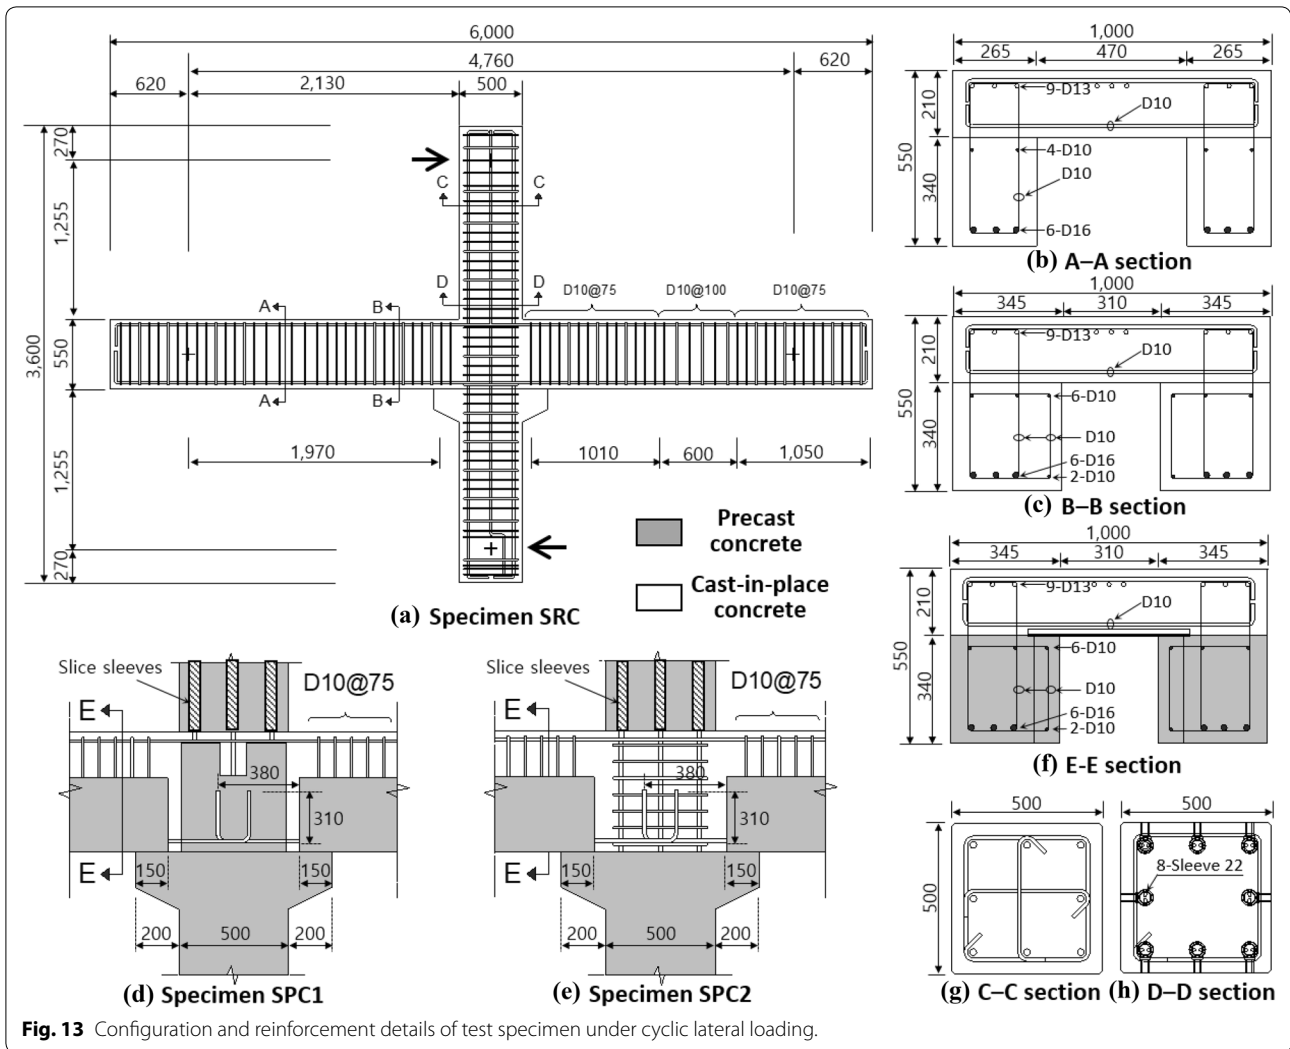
Configuration and reinforcement details of test specimen under cyclic lateral loading.
